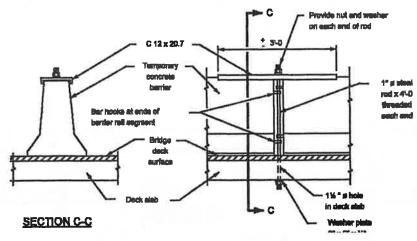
Indiana's anchoring method using extended joint pins through the bridge deck Source: IN DOT E801-TCCB-04
